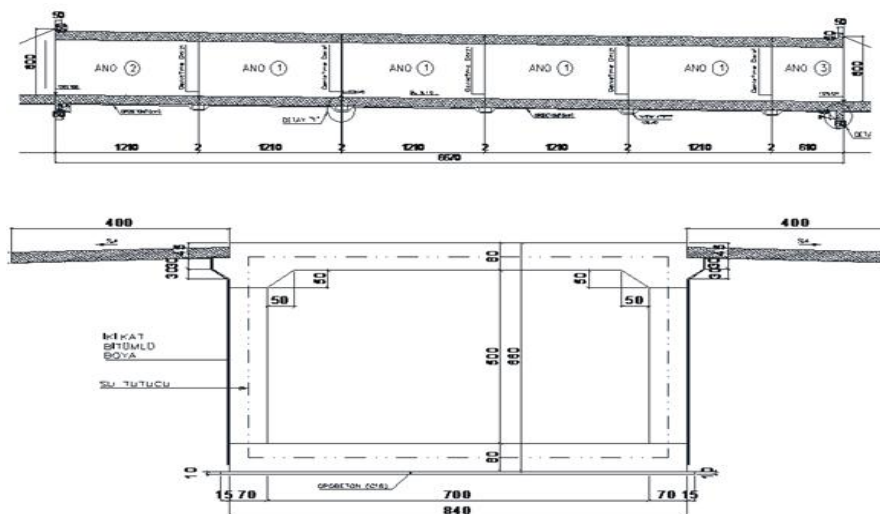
3. Thewidth and length sections of culvert which is considered on the study
